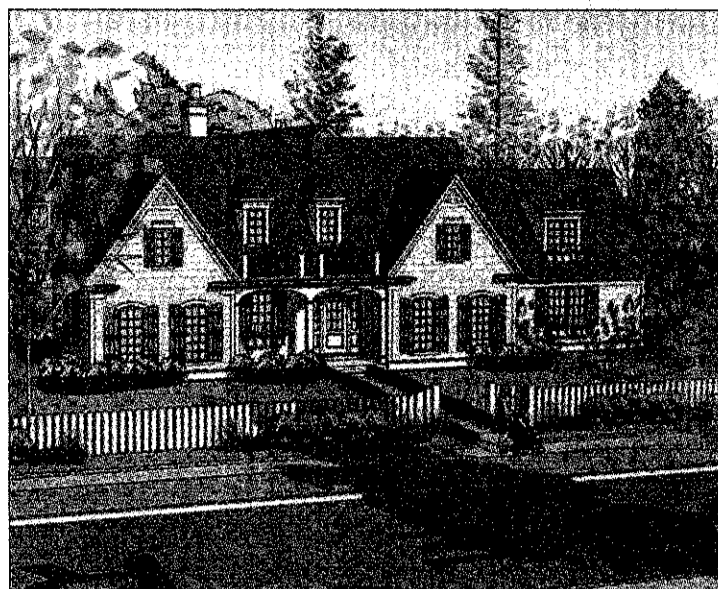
PHOTO RENDERINGS BY ROBERT WOOD AND ASSOCIATES
